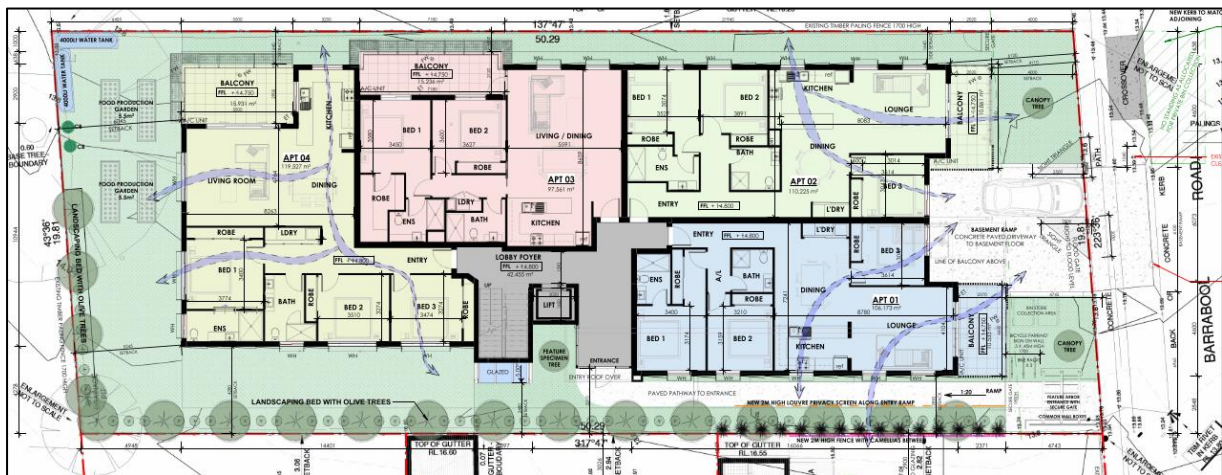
Ground floor plan showing common entry, apartment and private open space (balcony) layouts. Source: Application documents.
